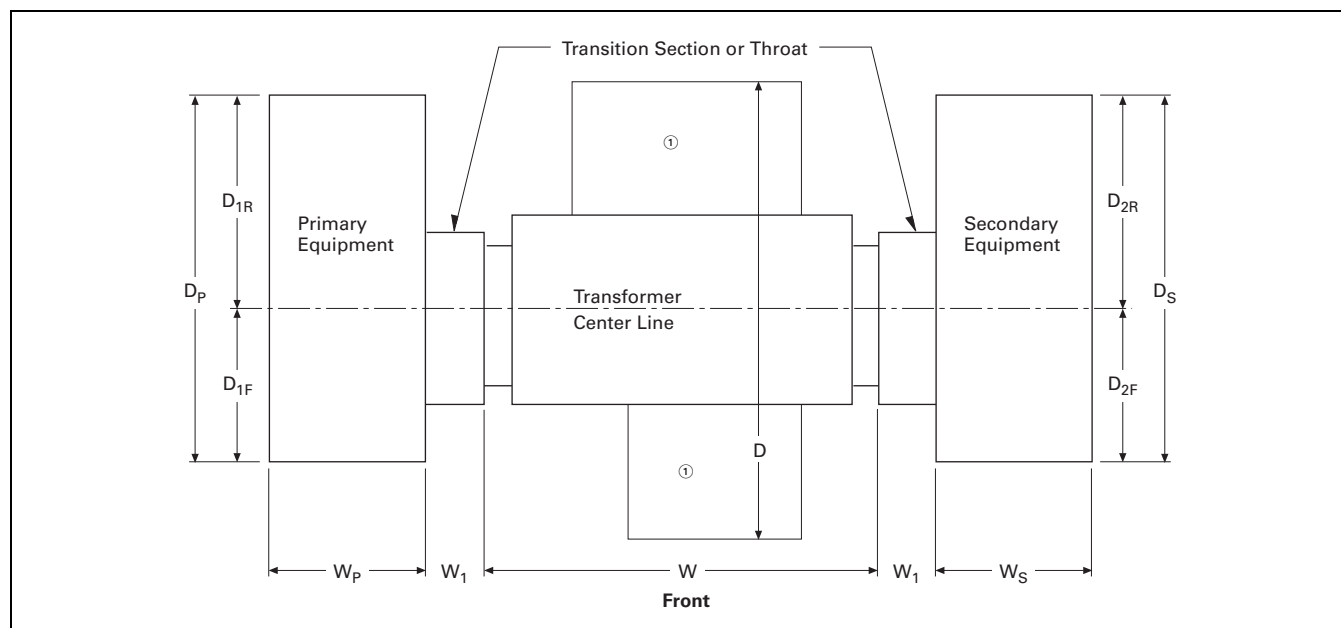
Outdoor Liquid-Filled Primary Unit Substations—Plan View
